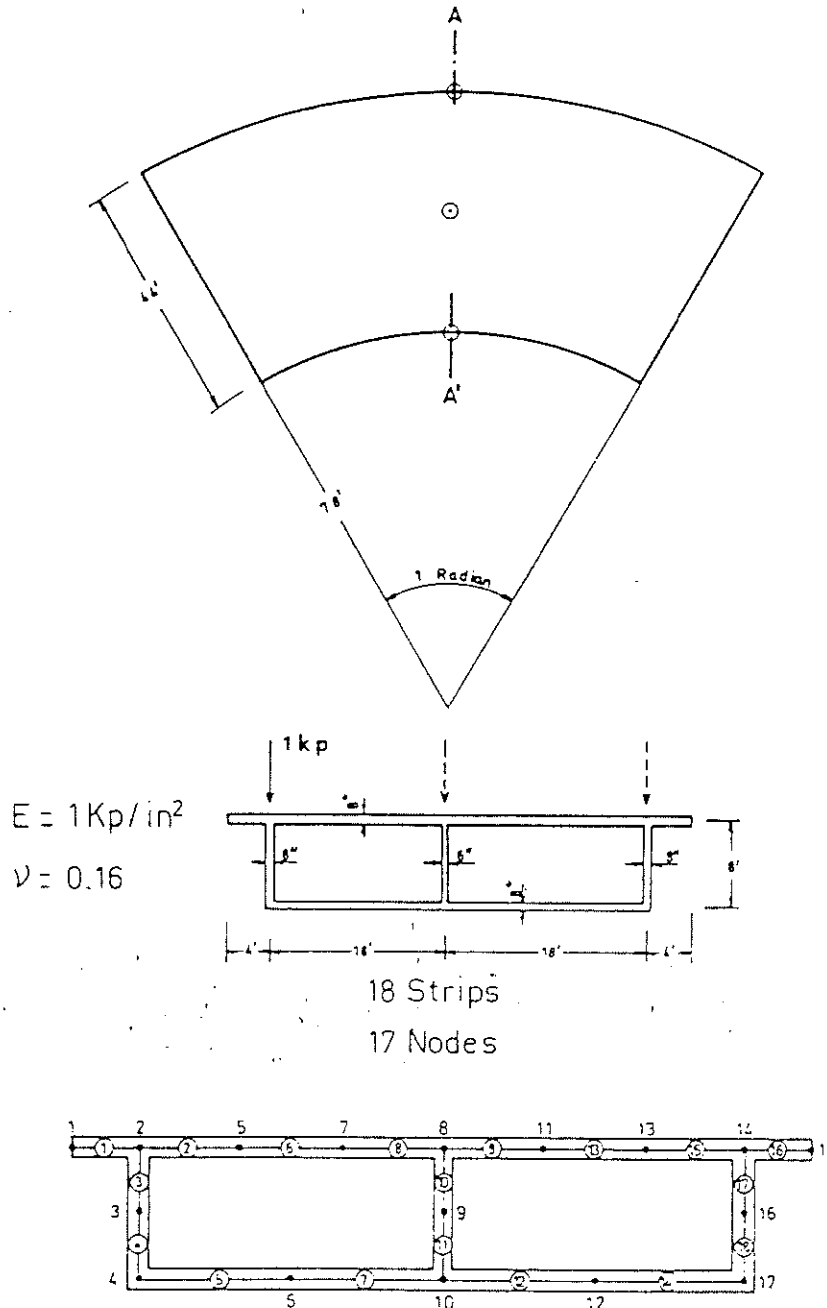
Curved box girder bridge: Geometry of the structure and finite strip idealisation into 18 strips.
